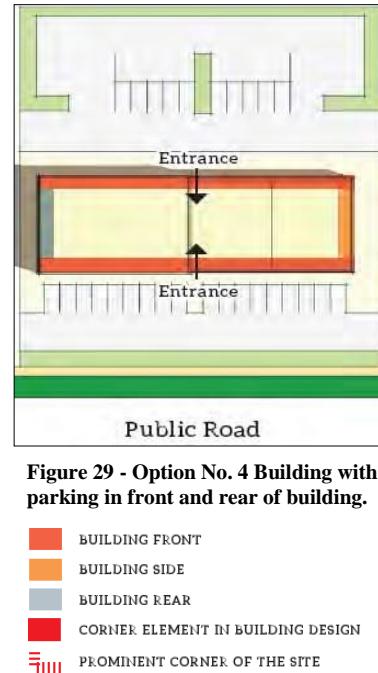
Option No. 4 Building with parking in front and rear of building.
